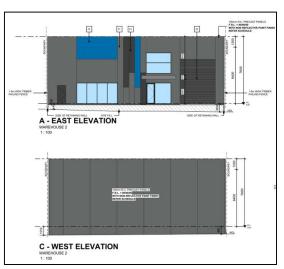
East & West Elevations (Warehouse 1 Left, Warehouse 2 Right)
